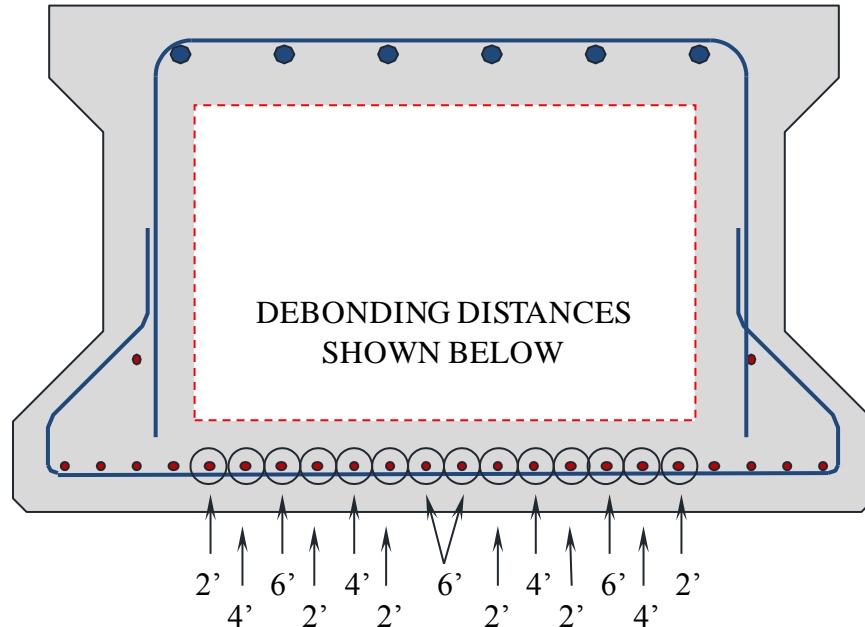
Box beam cross section and strand pattern (Chamberlain, 1997).
